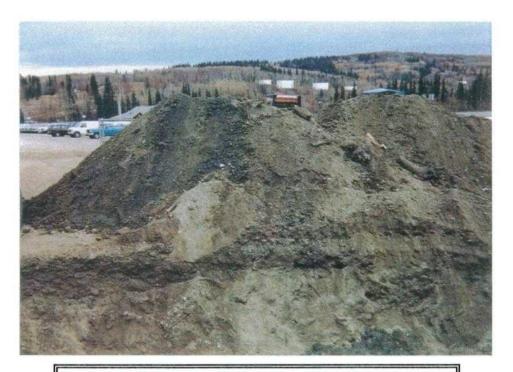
Excavated soils were temporarily stockpiled on site prior to disposal hauling.
